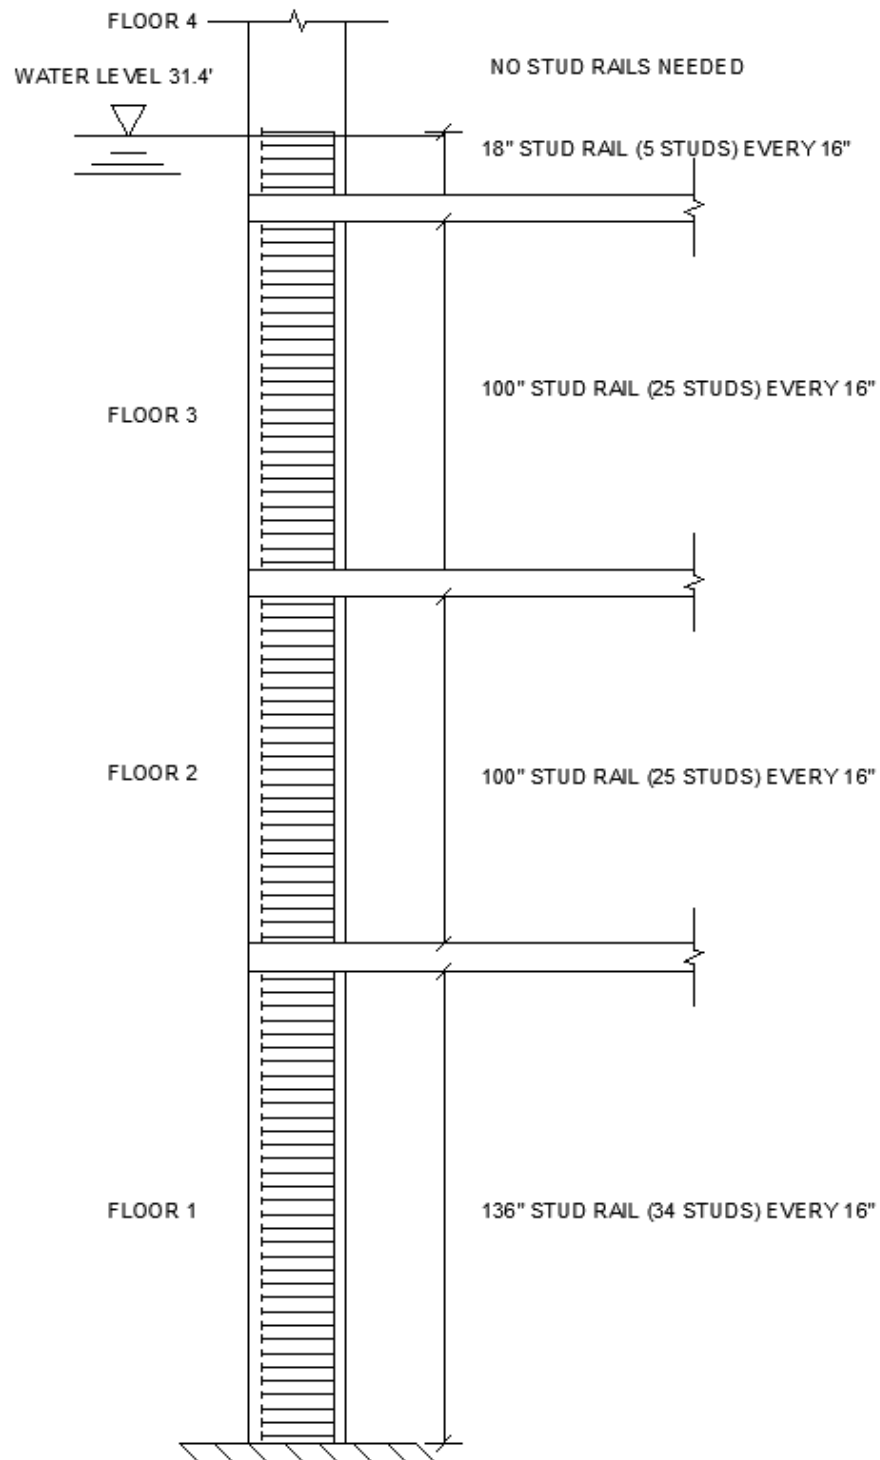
Stud Rail Diagram for the Floor 1 – 4
